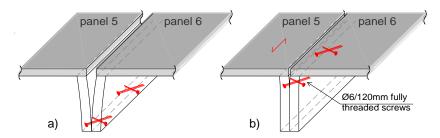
Connection of floor elements at the central beam-column-joint: a) bottom joist connection and b) top joist connection
